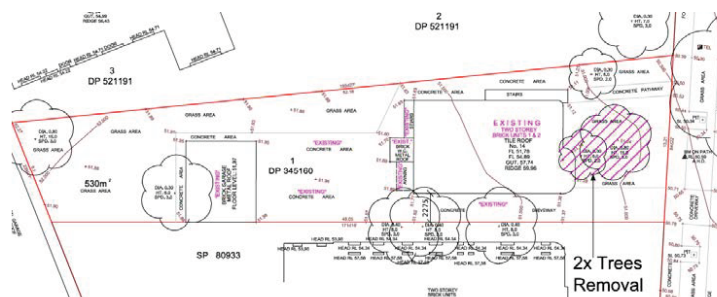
Site plan of 14 Hillcrest Avenue, Ashfield. Trees to be removed indicated in purple. [Source: Design – Basix – Build, ‘Demolition and Existing Site Plan’. 2022]
